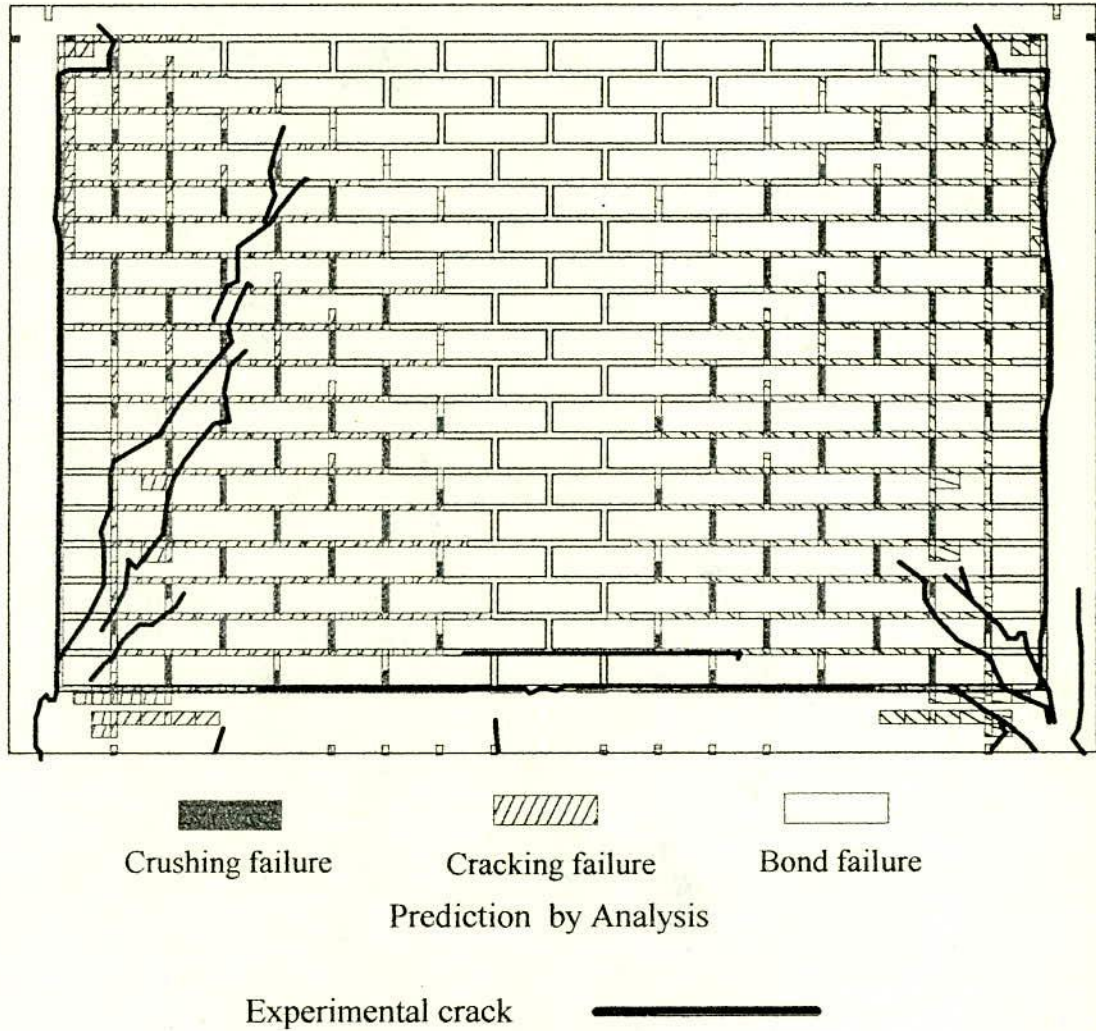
(a) Modes of Failure of Wall-beam Panel with Frame
